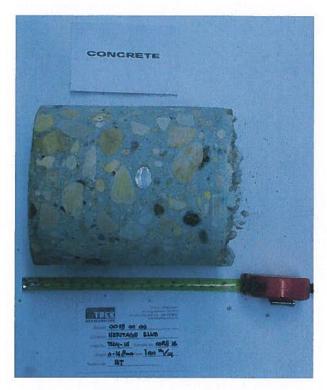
Asphalt and Concrete Core Sample from Test Hole TH14-16
